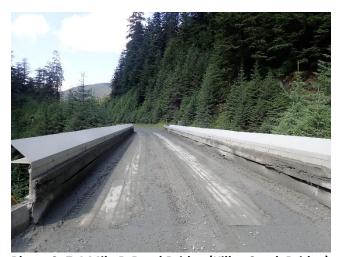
7.4 Mile B-Road Bridge (Killer Creek Bridge).
